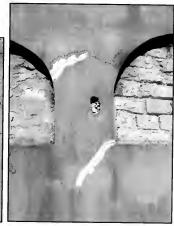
The cement encasing the oldest section of wall vaults is cracking and has been poorly patched.
